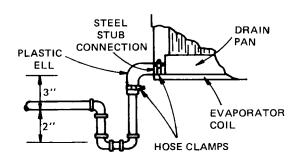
RECOMMENDED DRAIN PIPING REFRIGERANT MAINS
